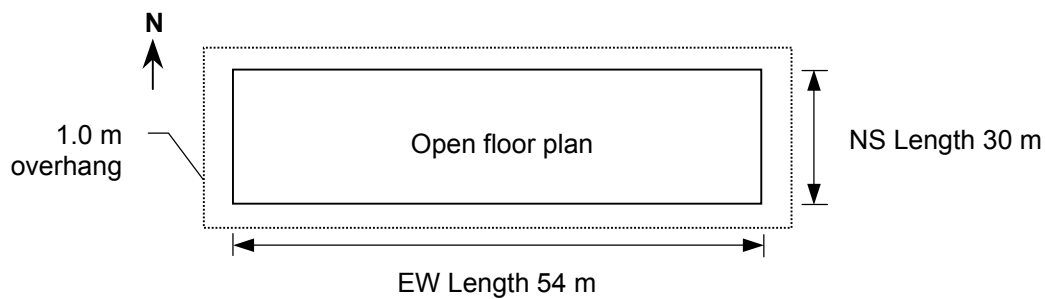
Floor plan of the base case building showing orientation, geometry and shading.
